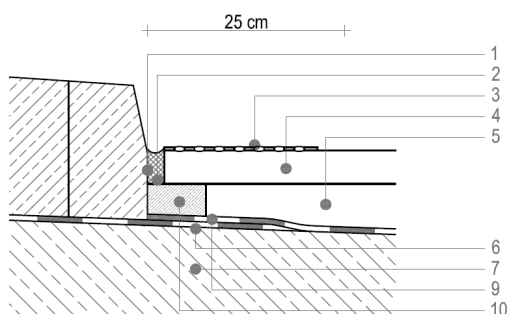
Detail of treatment of the joint along the curb
